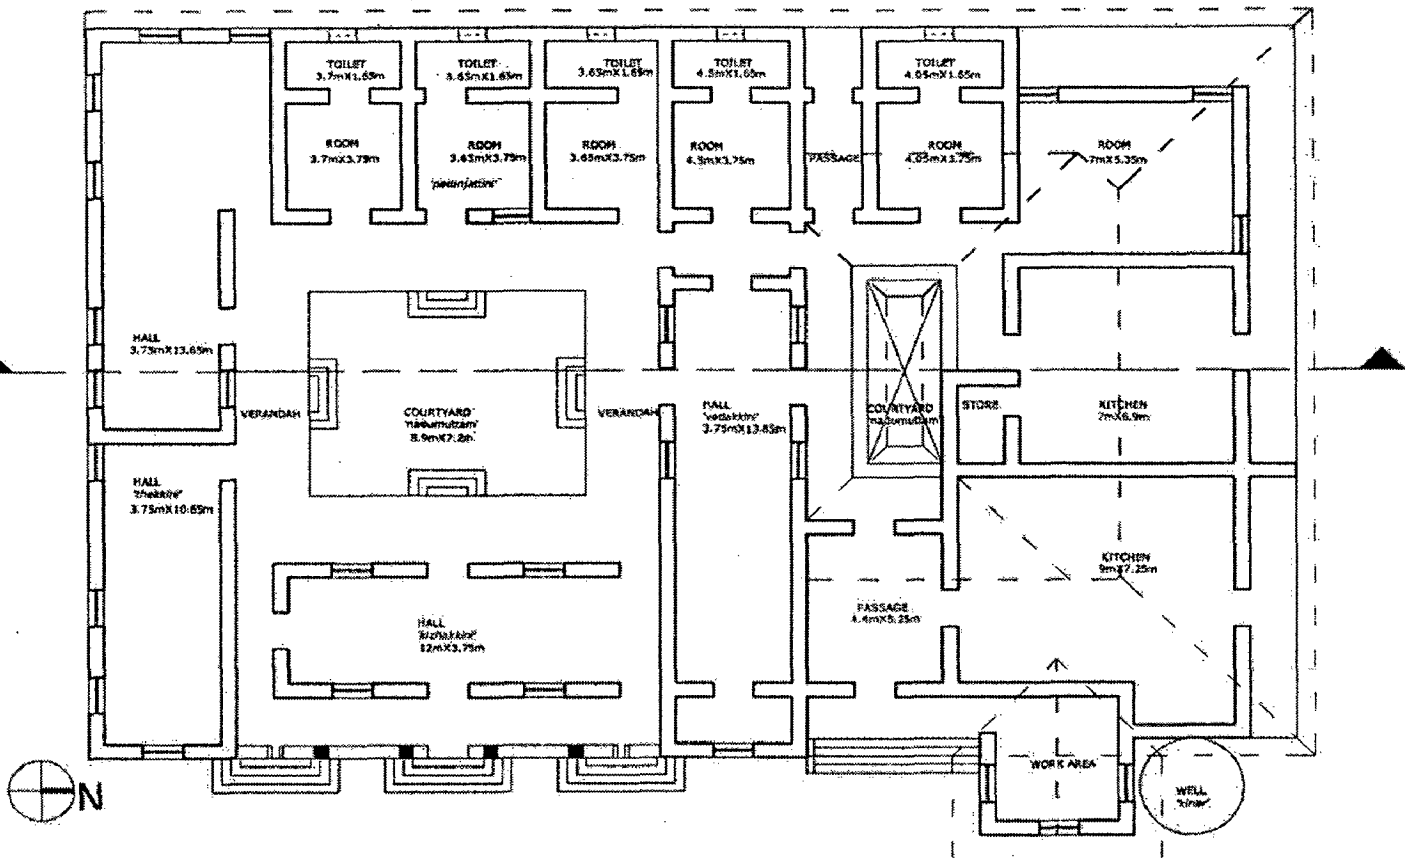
Ground floor plan of double storeyed courtyard house with two courtyards
